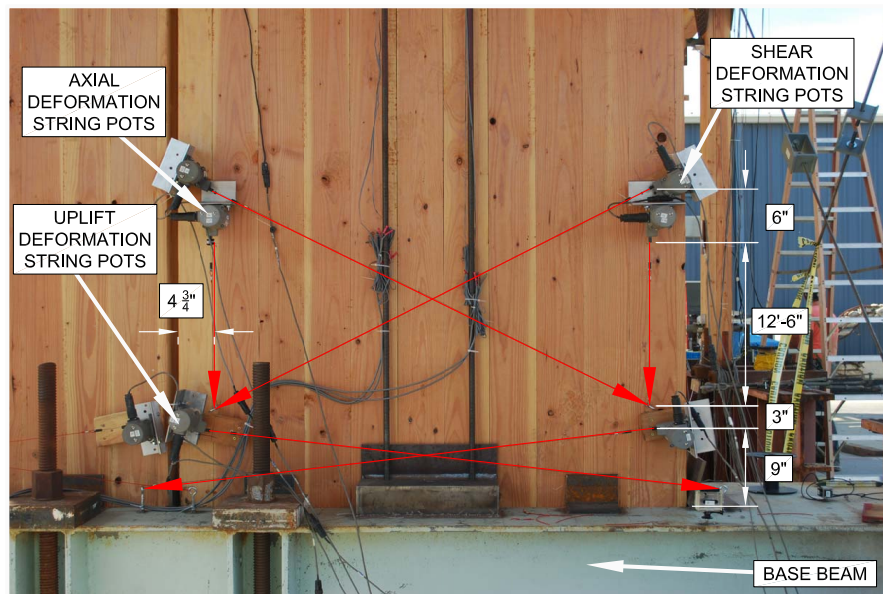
Typical layout of string pots to measure wall rocking and deformation
